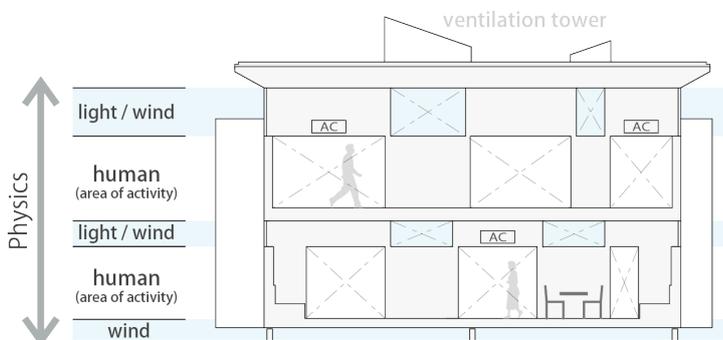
Multi layered sectioning, Photo.4 Floor inlets of engawa
